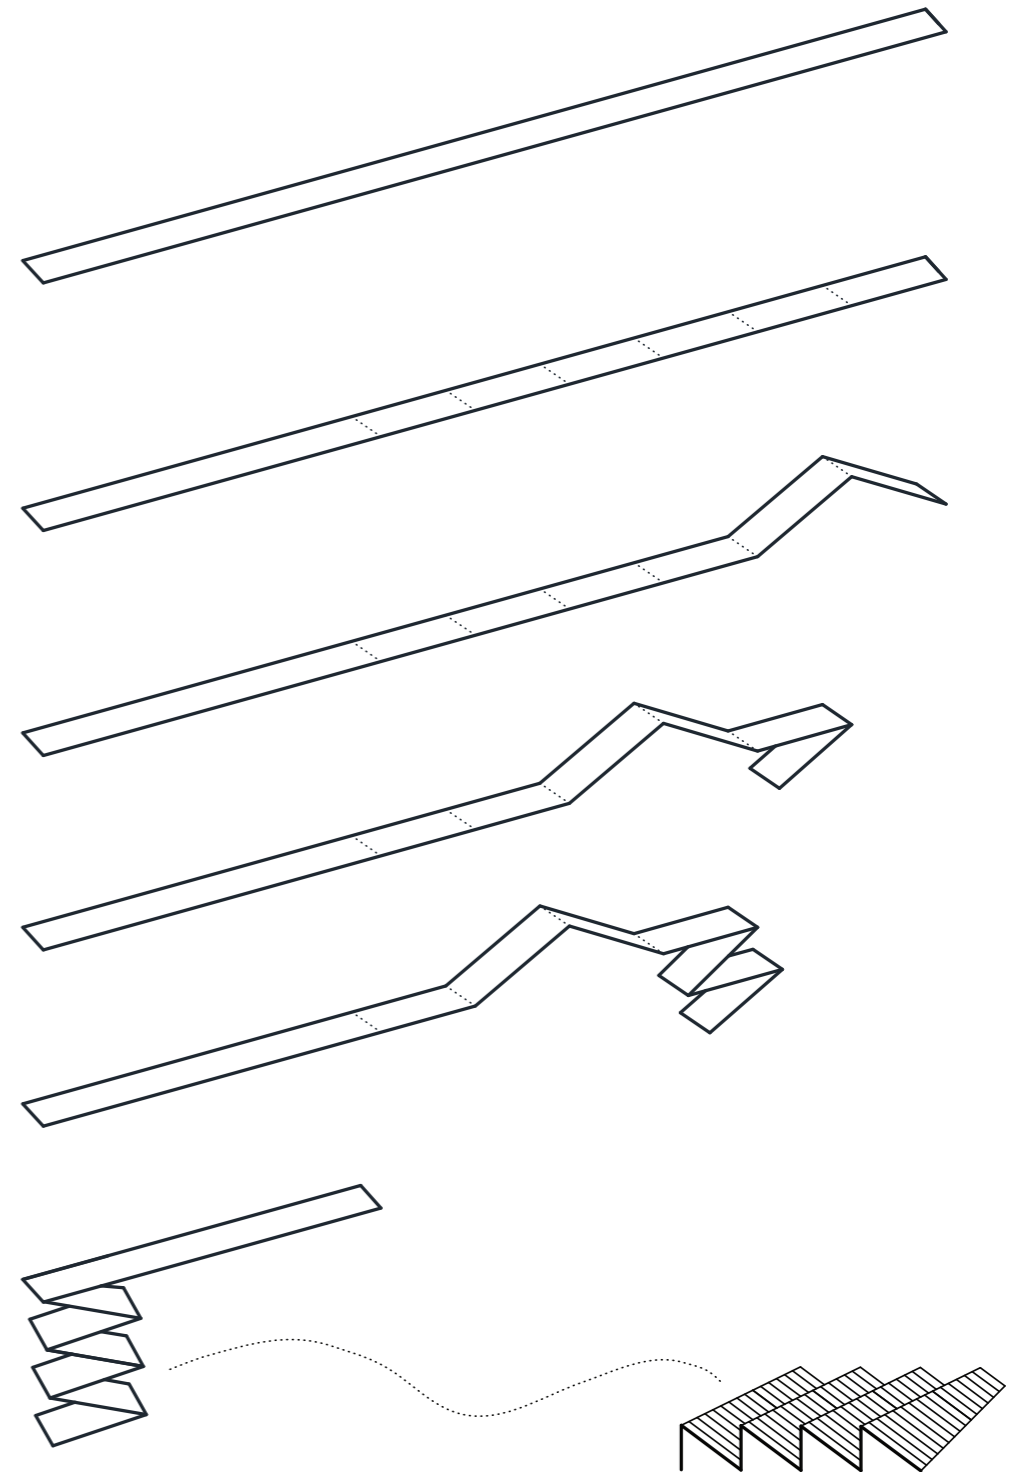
Diagram illustrating the folding of the recycling centre's roof. It mimics the surrounding typology of the traditional saw-tooth roof factories. The 'zig-zagging' of the fold allows the filtration of South light and provides a stepping down for roof top movement.
